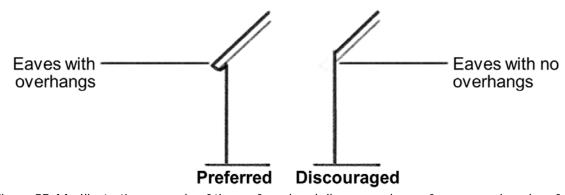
AA: Illustrative example of the preferred and discouraged use of eaves on sloped roofs
